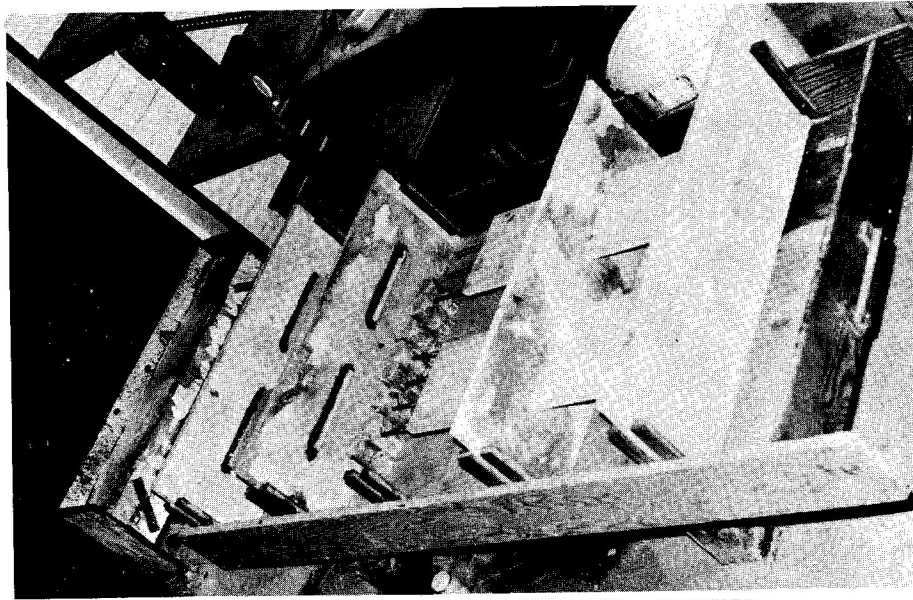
STORAGE RACK WITH FOUNDATION FORMWORK
